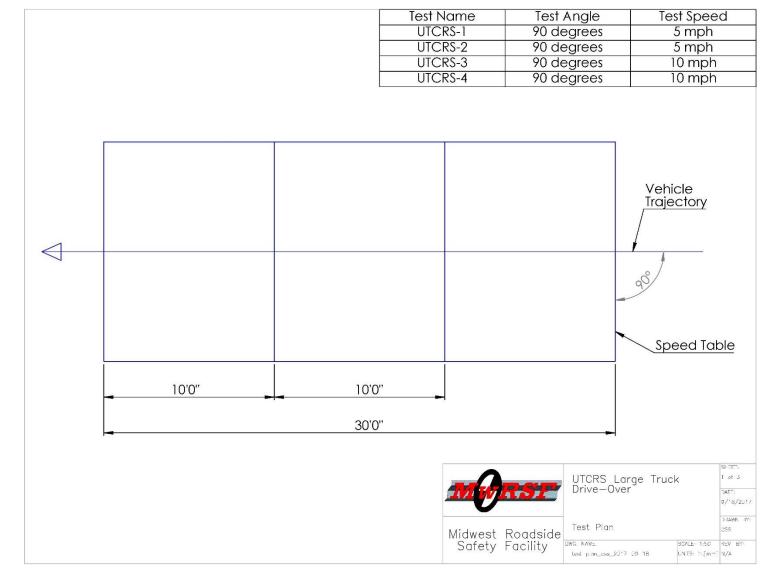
UTCRS Large Truck Drive-Over Test Plan – Page 1
